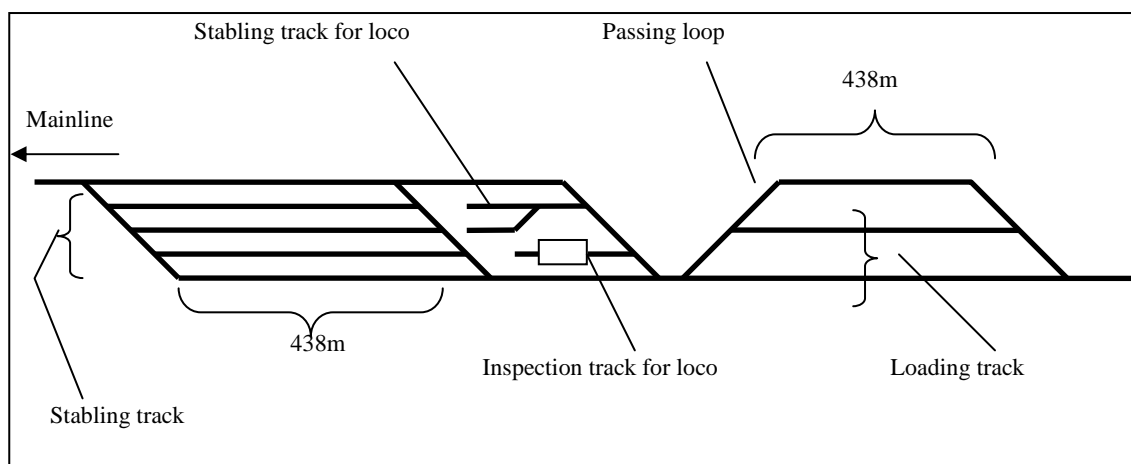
Typical Track Layout in Freight Terminal Facility
